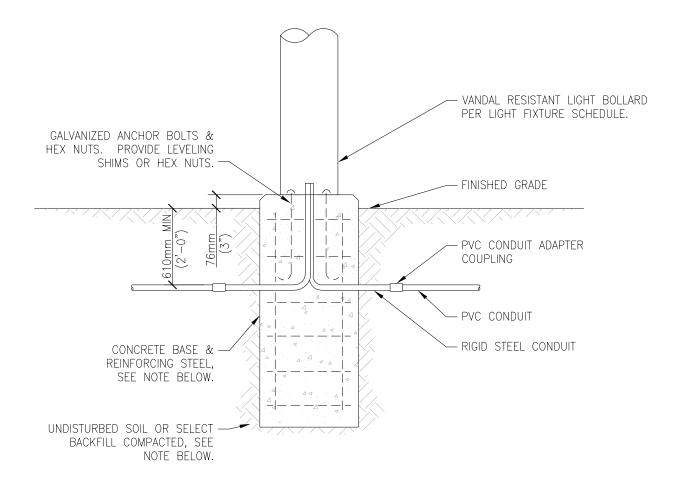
DETAIL TITLE / BOLLARD BASE DETAIL - PAVED AREAS
